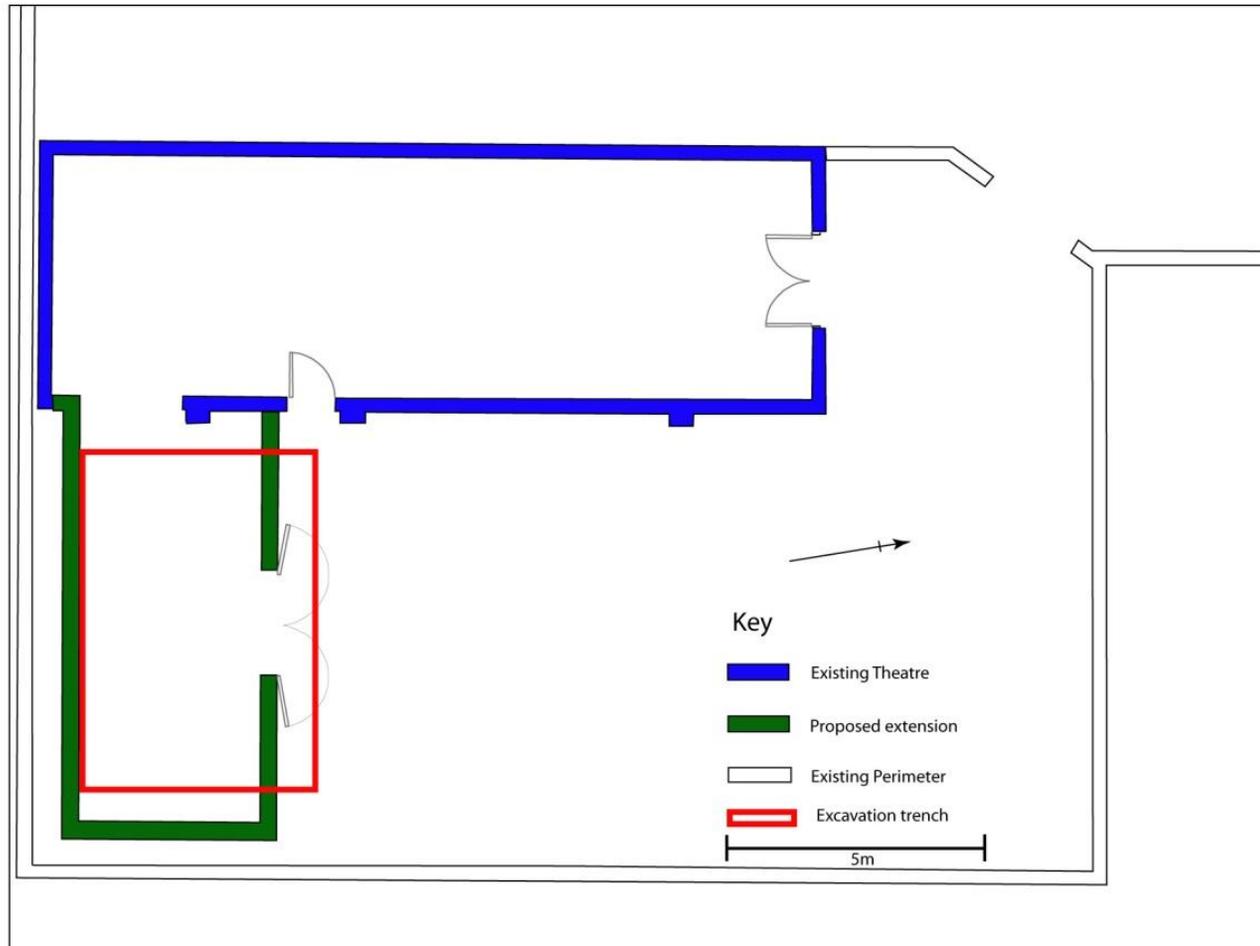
Plan of theatre and proposed extension showing Excavation Trench
